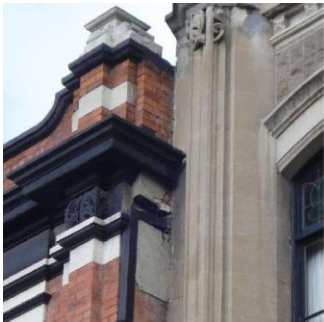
Damaged building with façade setback, Christ Church.
